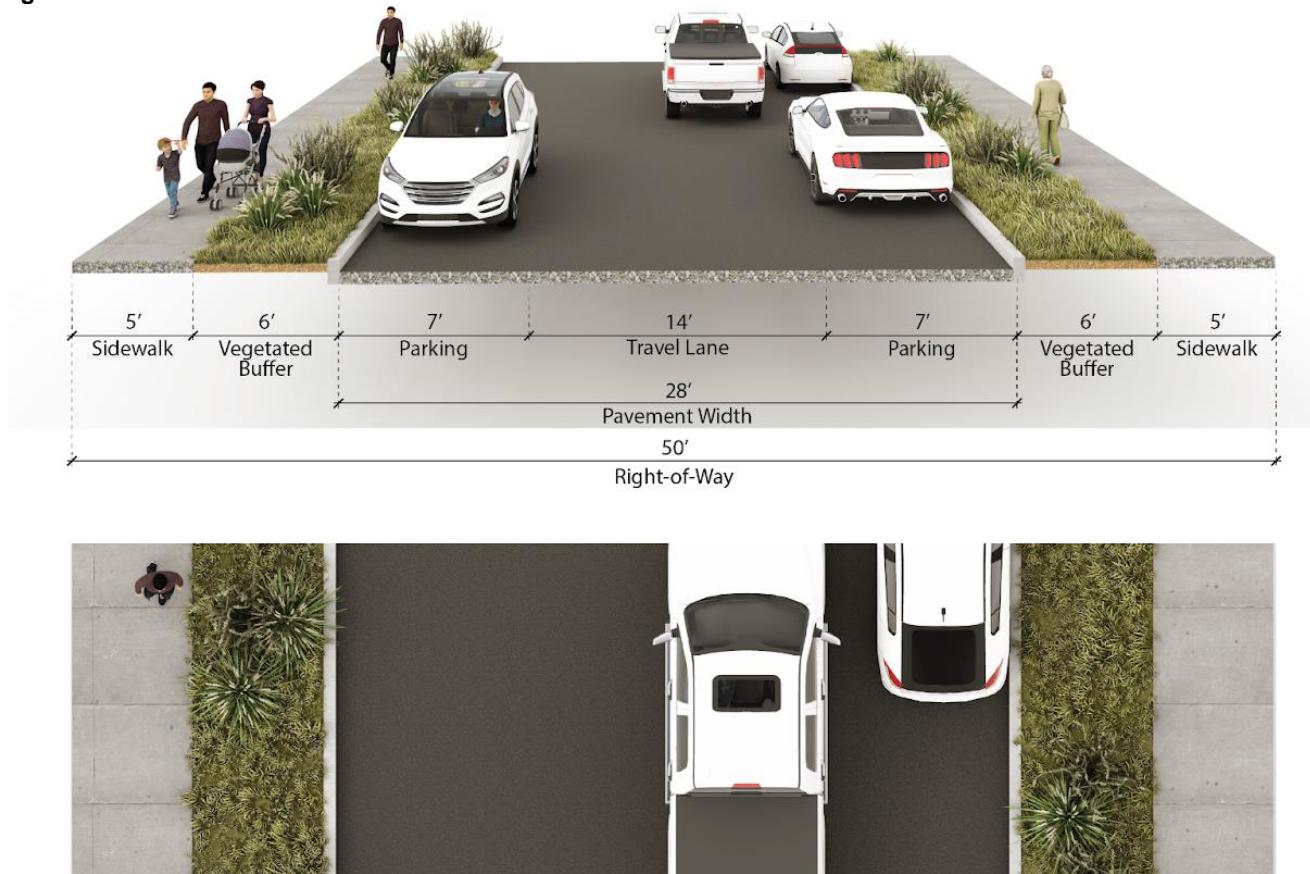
Cross-section for Urban Local Street – Minor Residential Street
